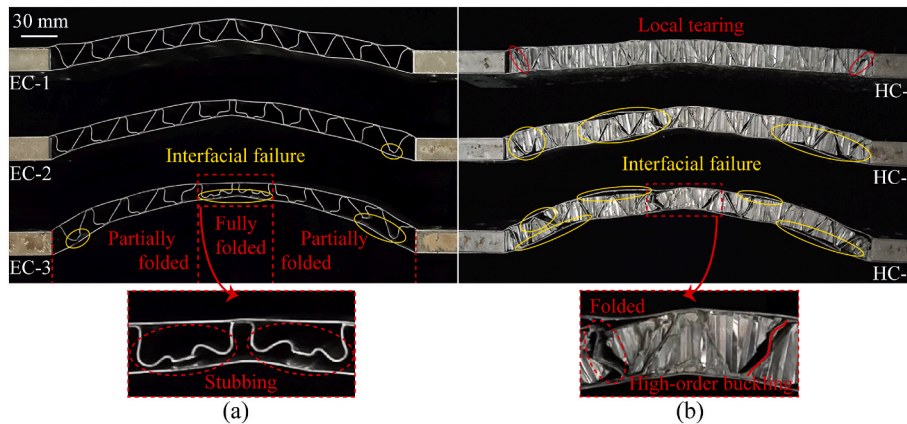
Final deformation profiles of (a) empty corrugated core sandwich beams and (b) honeycomb-corrugation hybrid sandwich beams.
